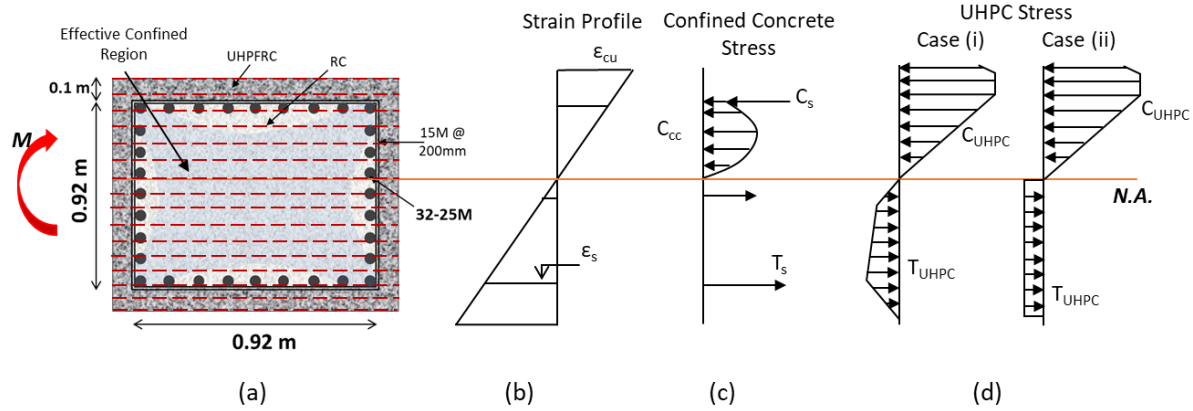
7: (a) Schematic representation of section layered analysis for concrete column confined with a UHPFRC jacket (b) Strain profile across the section (c) Confined concrete stress block (d) UHPFRC stress blocks
